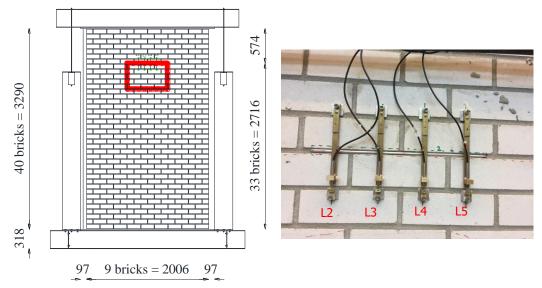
Test set-up for single flatjack test at location 03. The dimensions are in mm.
